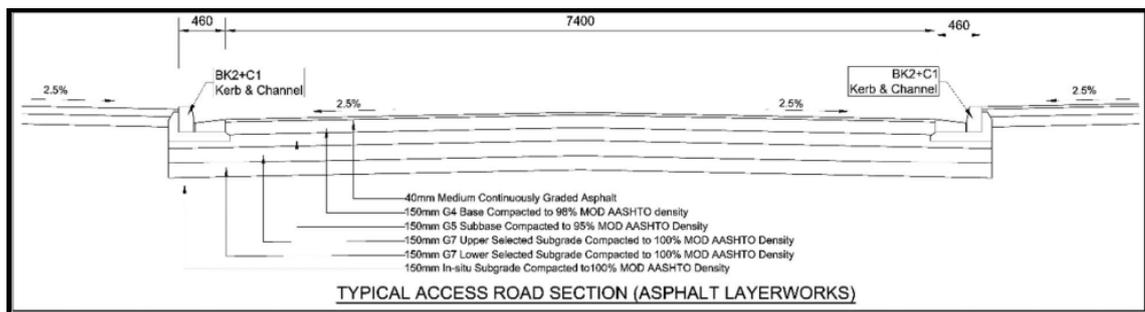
Proposed Road Layerworks: Asphalt- 640 mm total thickness (source: Walters, 2020)
